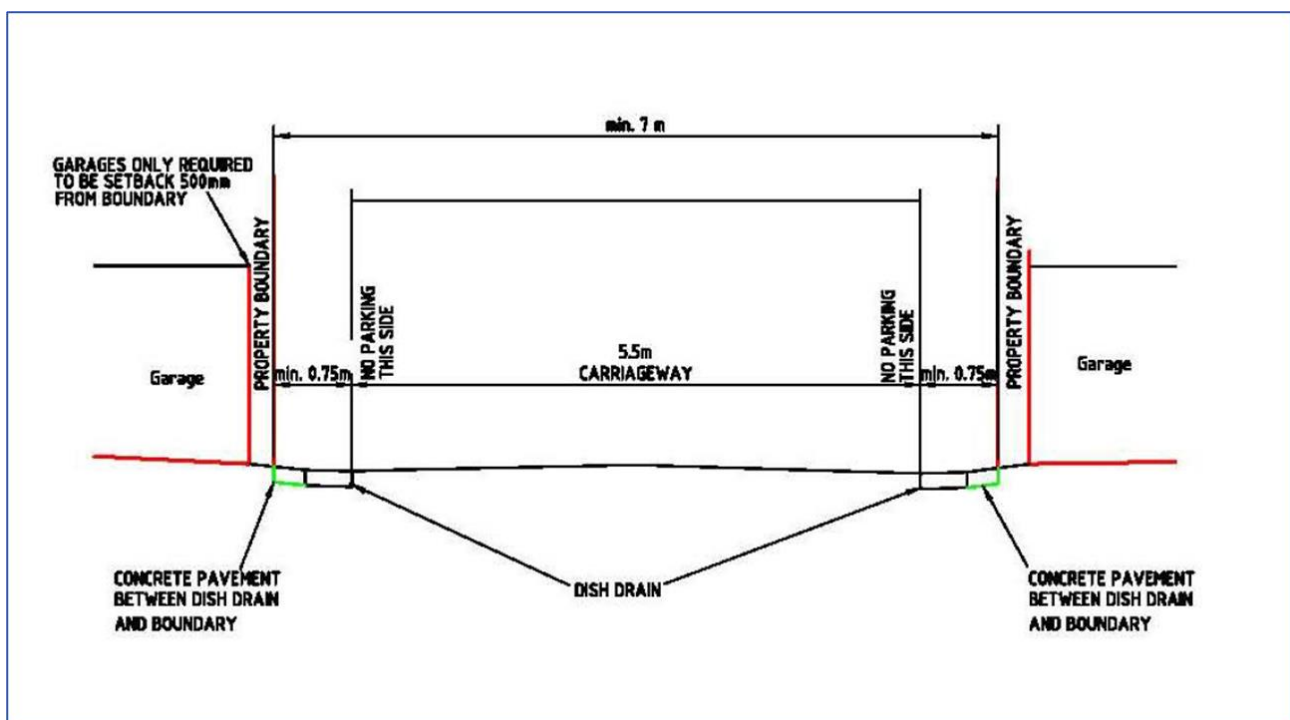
Typical cross section of a residential laneway<sup>6</sup>
